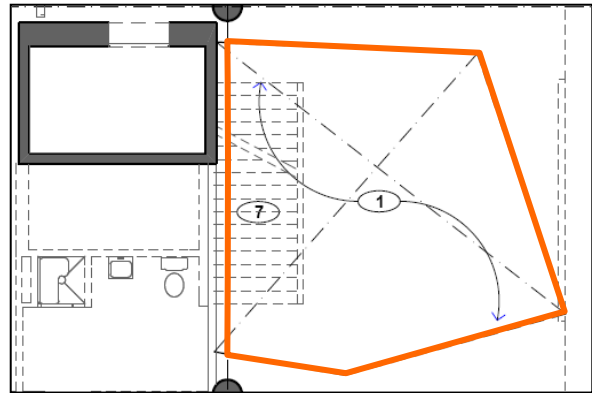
Third Floor Slab Demolition Plan, Courtesy of Core Architects
